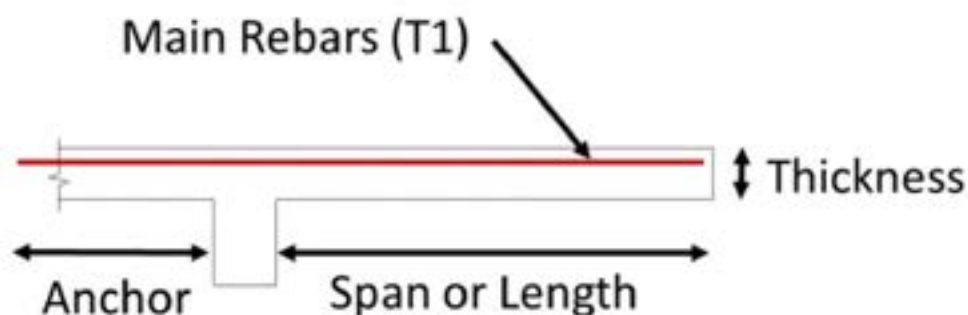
CANTILEVER SLAB (ONLY MAIN REBARS SHOWN)
